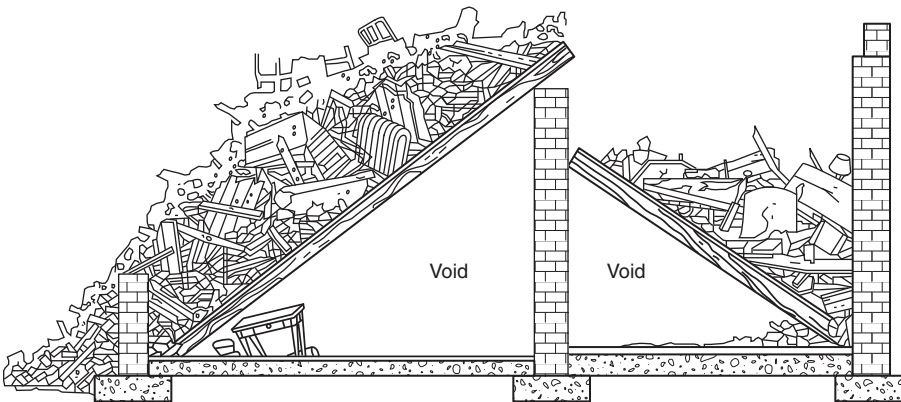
(e) A-Frame Floor Collapse. [Courtesy of Defense Civil Preparedness Agency (U.S. Department of Defense)]
